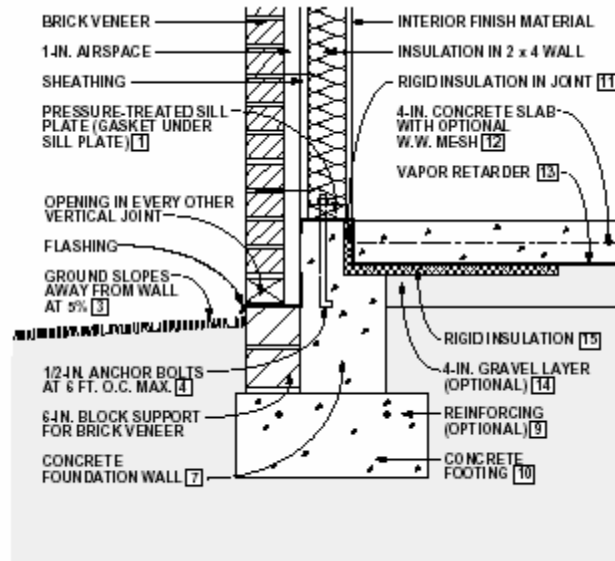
illustrates a slab-on-grade with a concrete foundation wall. The approach above-grade wall system consists of a 2 x 4 wood frame wall with brick veneer. Rigid insulation is placed horizontally under the slab perimeter and vertically in the joint at the slab edge. Because the floor slab rests on the ledge of the foundation wall, it is important to compact the soil beneath the slab to minimize settlement and cracking of the slab.
